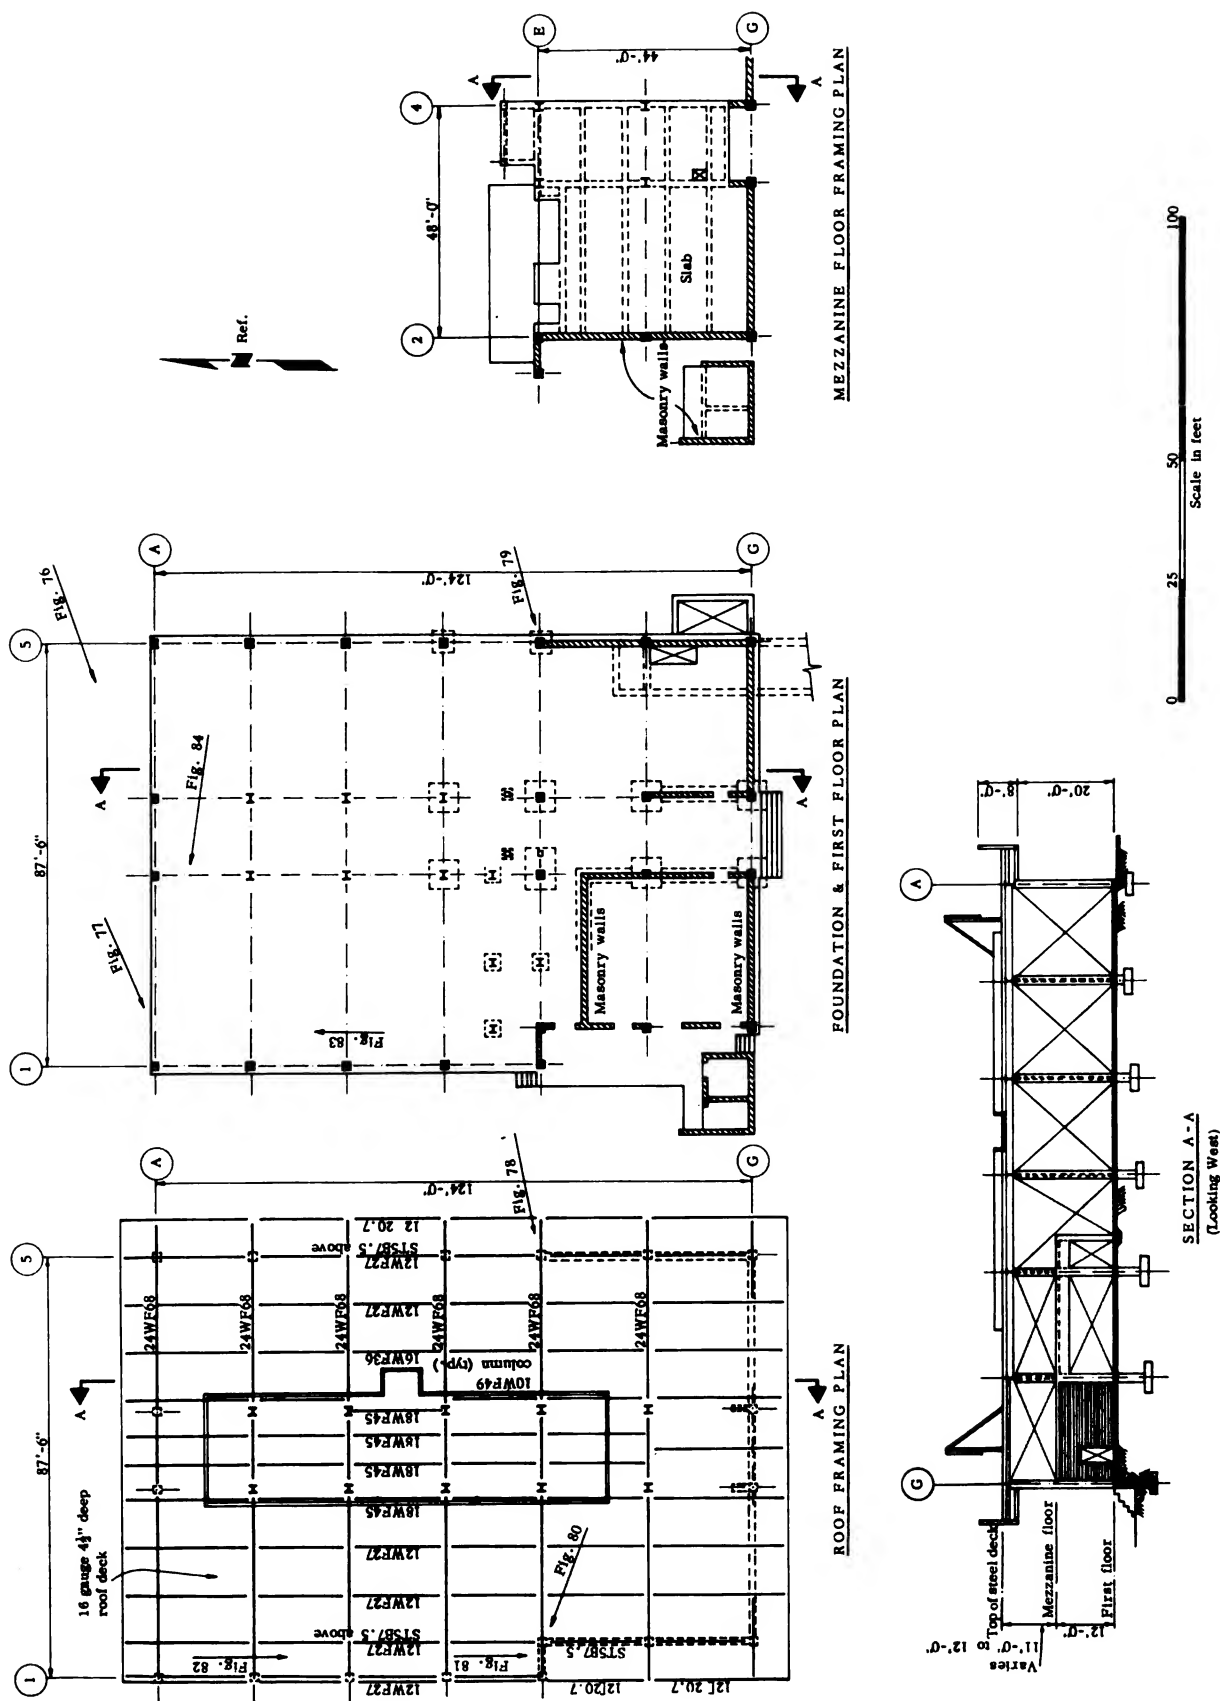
Olive View Hospital, heating and refrigeration plant. Plans and building cross section.
